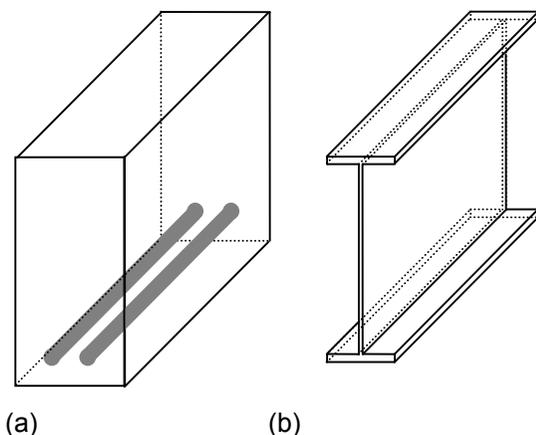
Schematic of structures: (a) reinforced concrete beam and (b) steel I-beam
